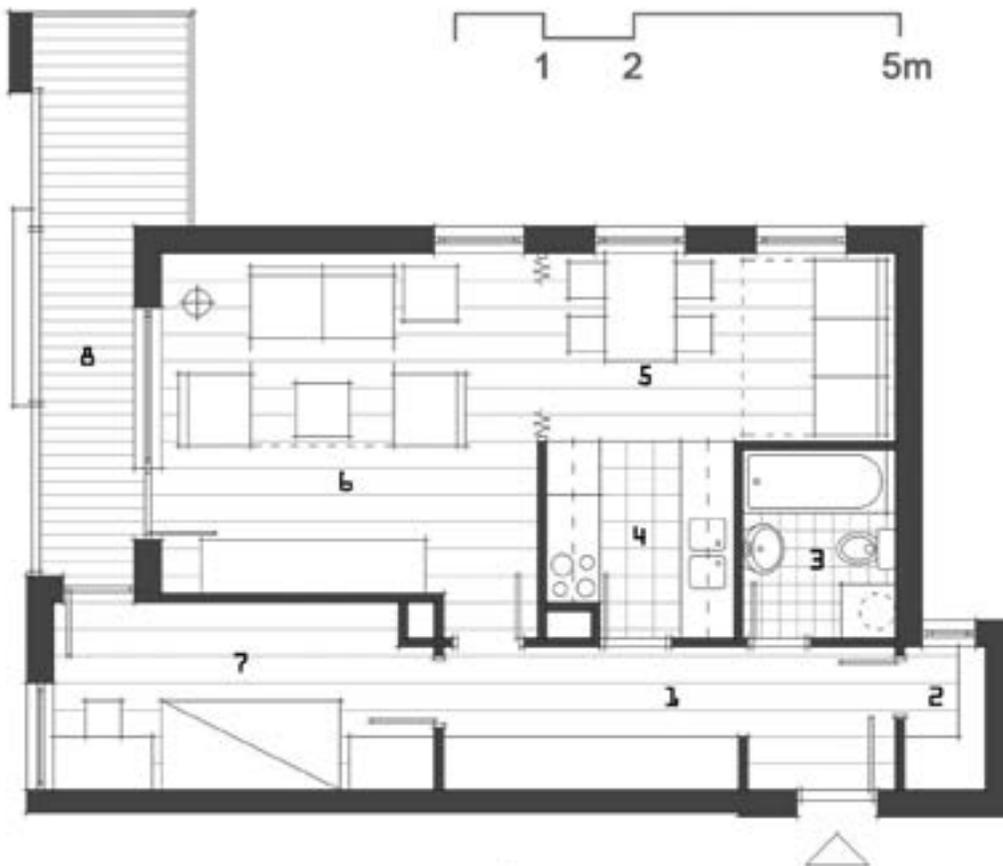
A plan of a storey in a building in Niš, from the public competition (Authors: Tamara and Miloš Komlenić)
